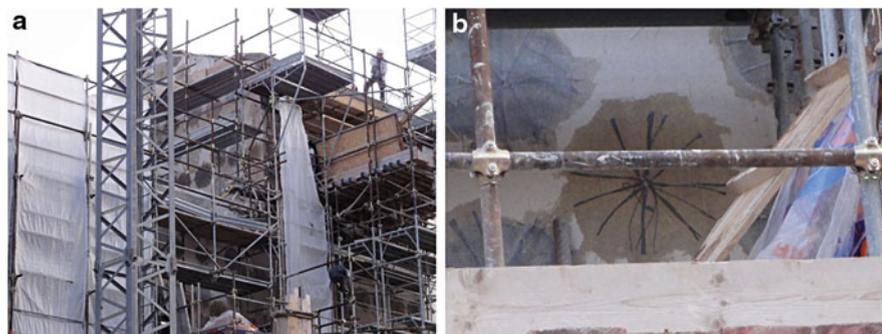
Extensive use of reinforced coring with grouted injection with epoxy resins on the end wall of a 5 storey residential palace in the historic centre of L'Aquila
